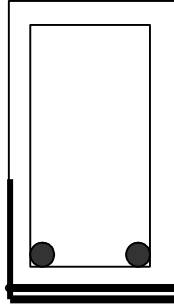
Carbon fiber wrapped beams cross section (2 longitudinal layers)
